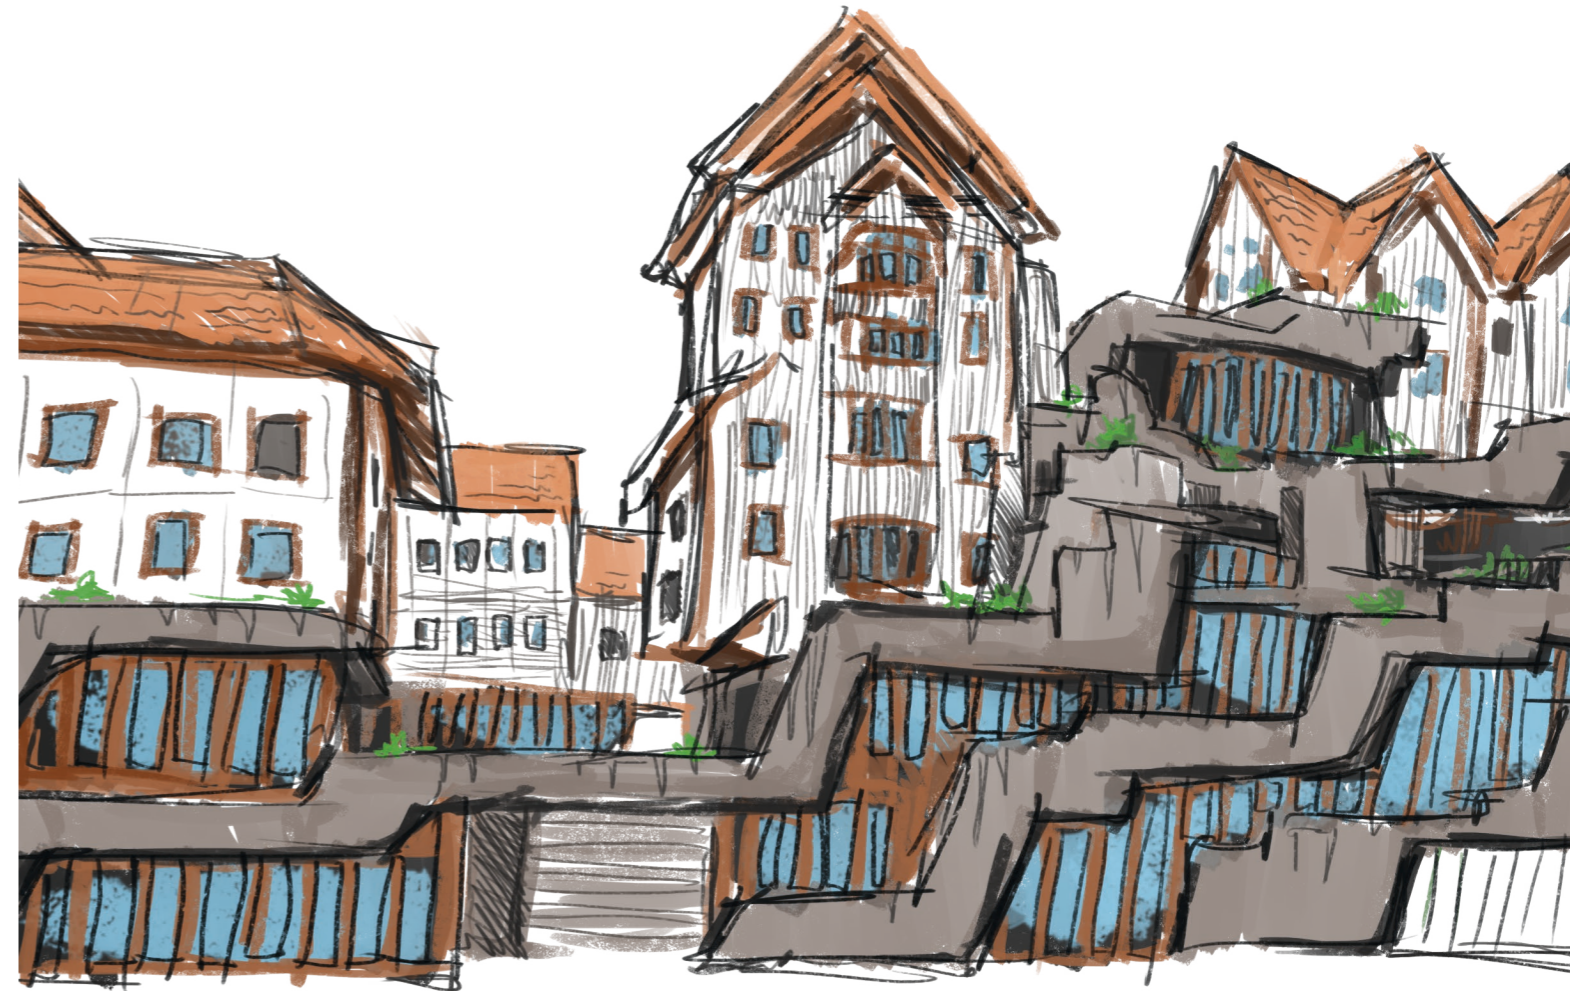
, Perspective drawing of the south eastern facade. Wooden buildings standing on top of a concrete base.
